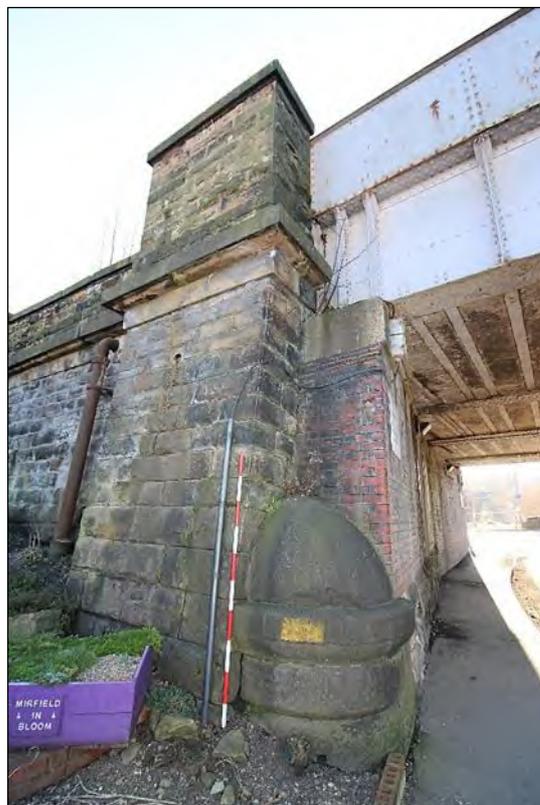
Northern elevation, span 12, small, truncated pier, 2m scale
